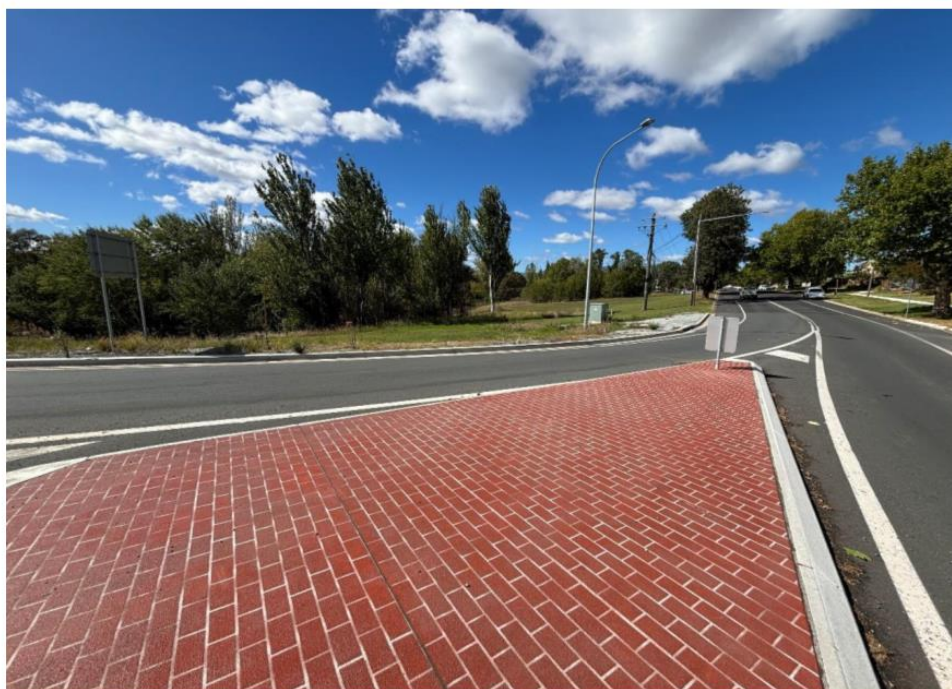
View – looking East – from roundabout at end of Capper Street – down Capper Street - photo taken 7/4/2025
